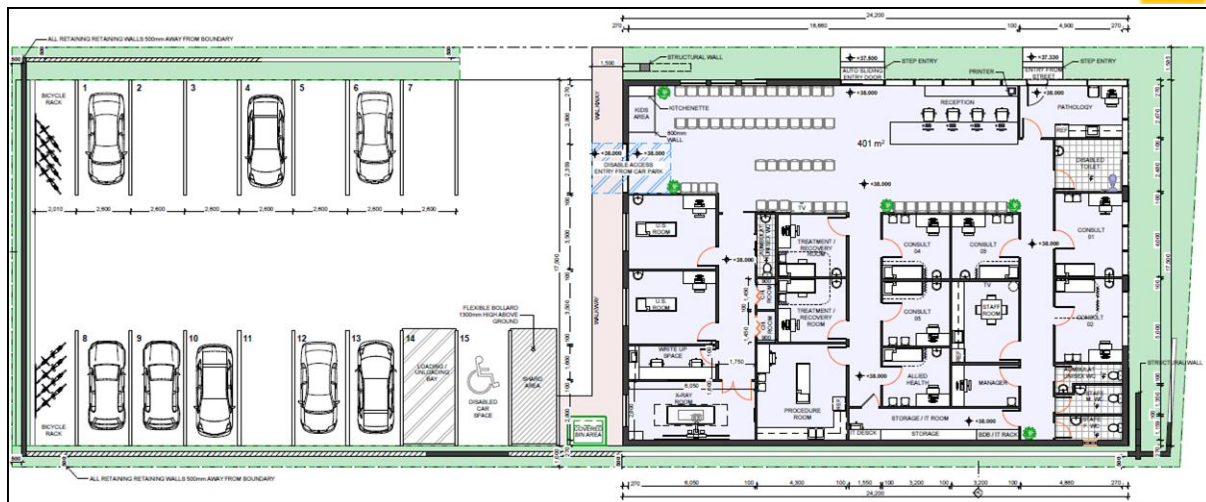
Proposed floor plan Source: A&H Eco Group Pty Ltd
